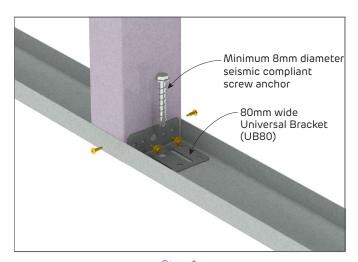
Head Connection HC5 on Slab Edge FIGURE 22c Head Connection HC5 With Universal Bracket UB80 Elevation
